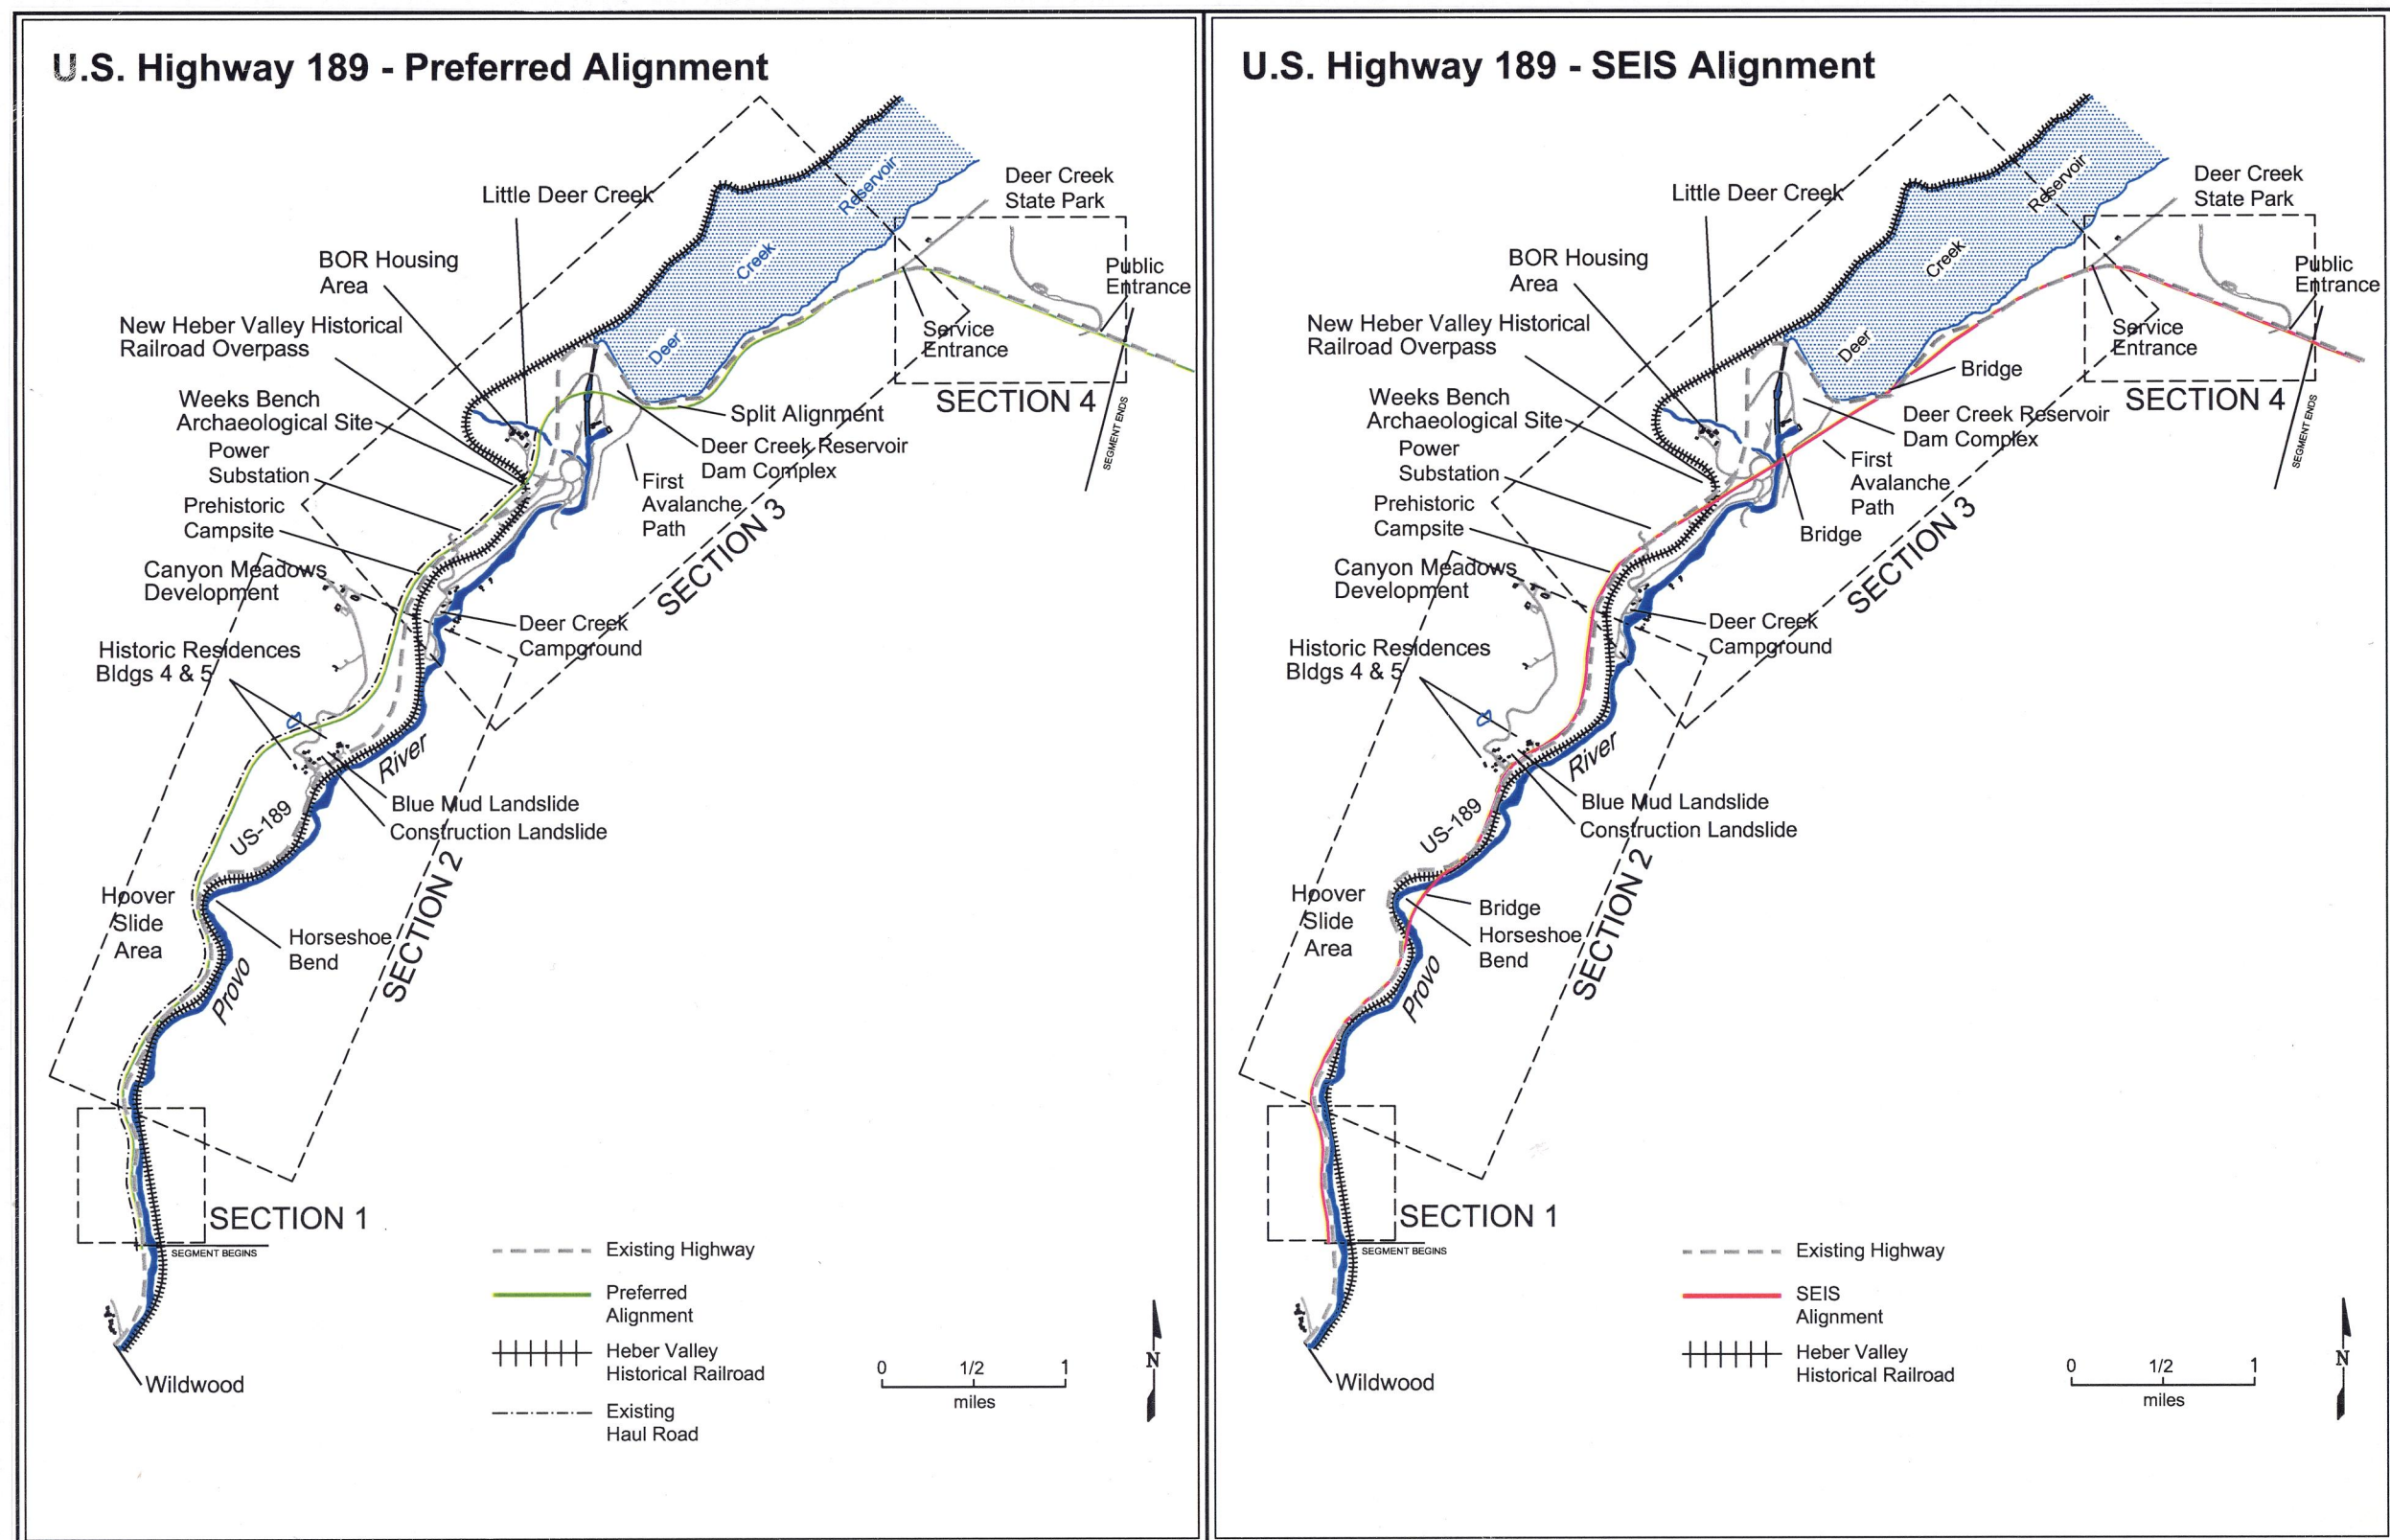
The 1989 SEIS and 2002 Preferred Alignments for the Wildwood to Deer Creek State Park Segment, Provo Canyon Highway Improvement Project.
